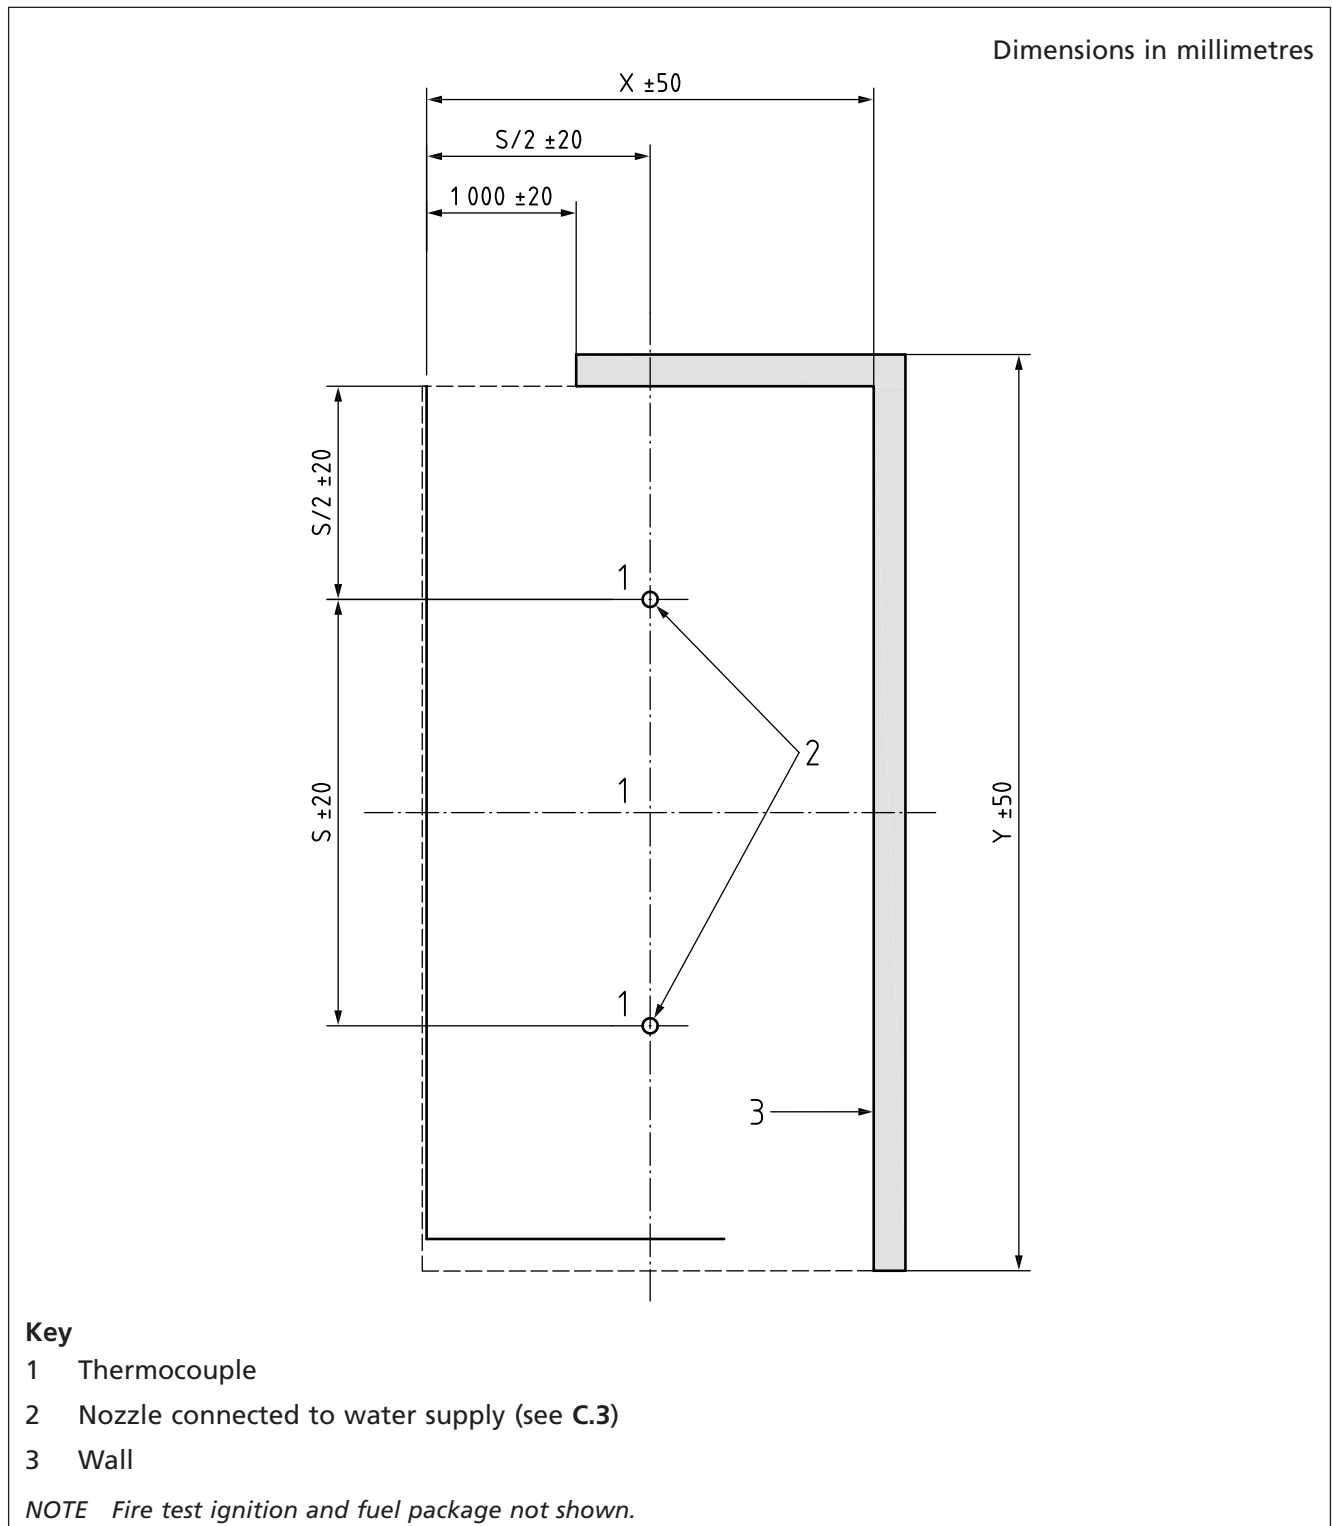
Ventilation test layout showing a two-nozzle arrangement
